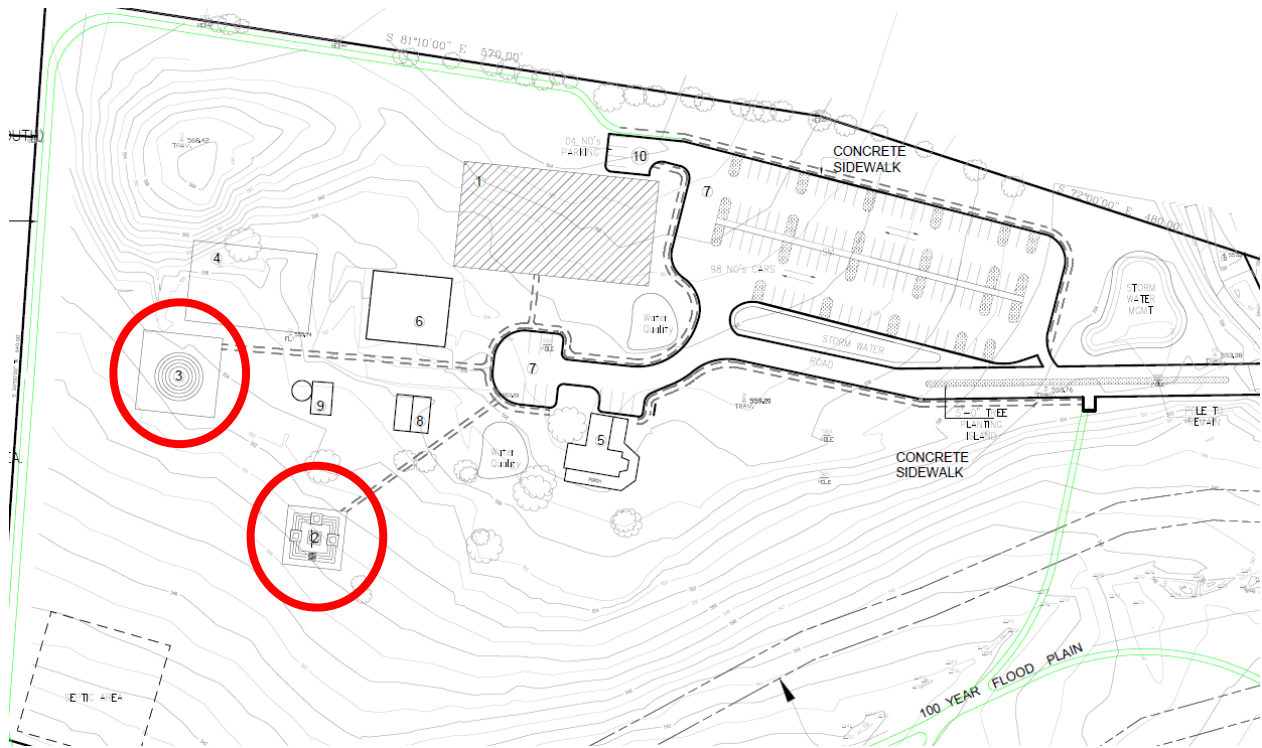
Current site plan showing the proposed location of the proposed podiums.
